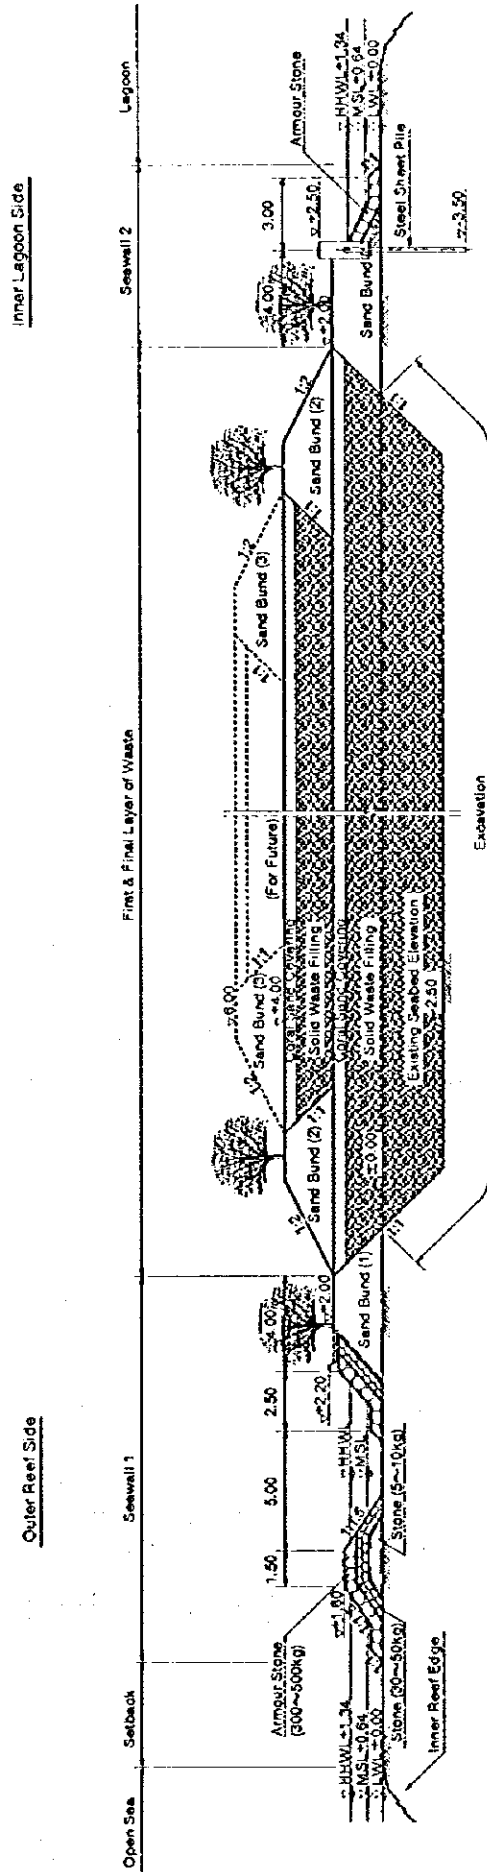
Section of Proposed Seawalls and Waste Filling Plan
